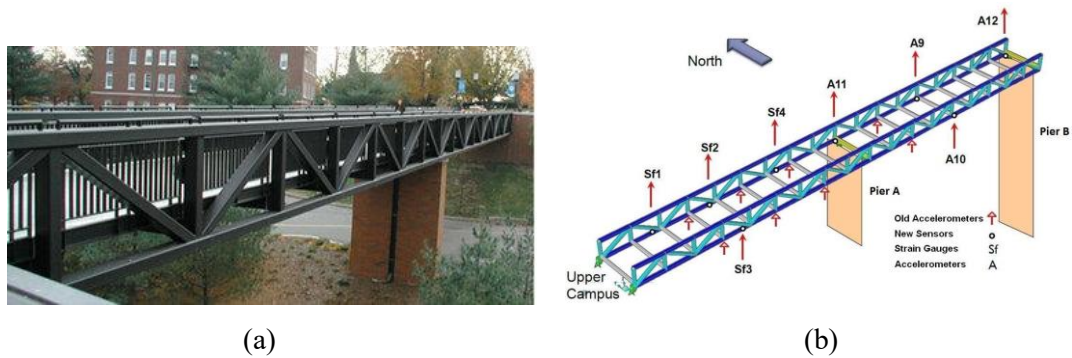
(a) Overview of the Dowling Hall footbridge; (b) Locations of installed sensors [32].
